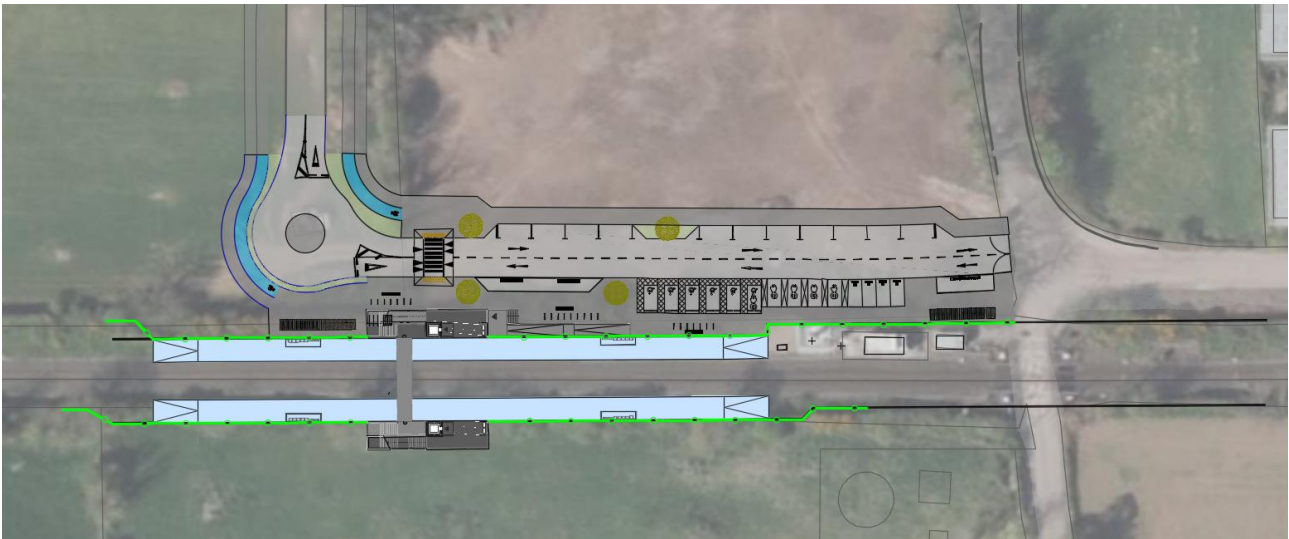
Water-Rock Park and Ride Car Park Layout
